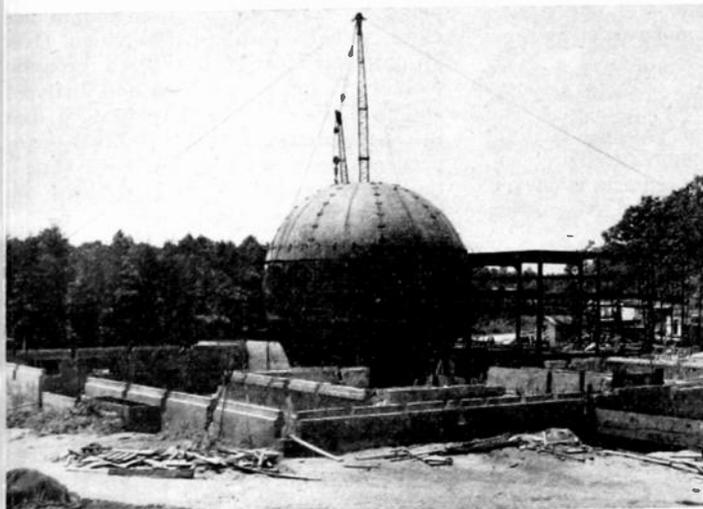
The Supersonic Wind Tunnels Building, looking southwest.
